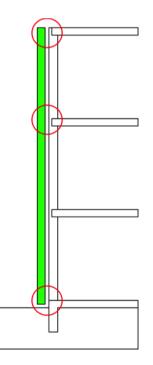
The authors chosen attachment of the prefabricated facade onto the existing building facade.
